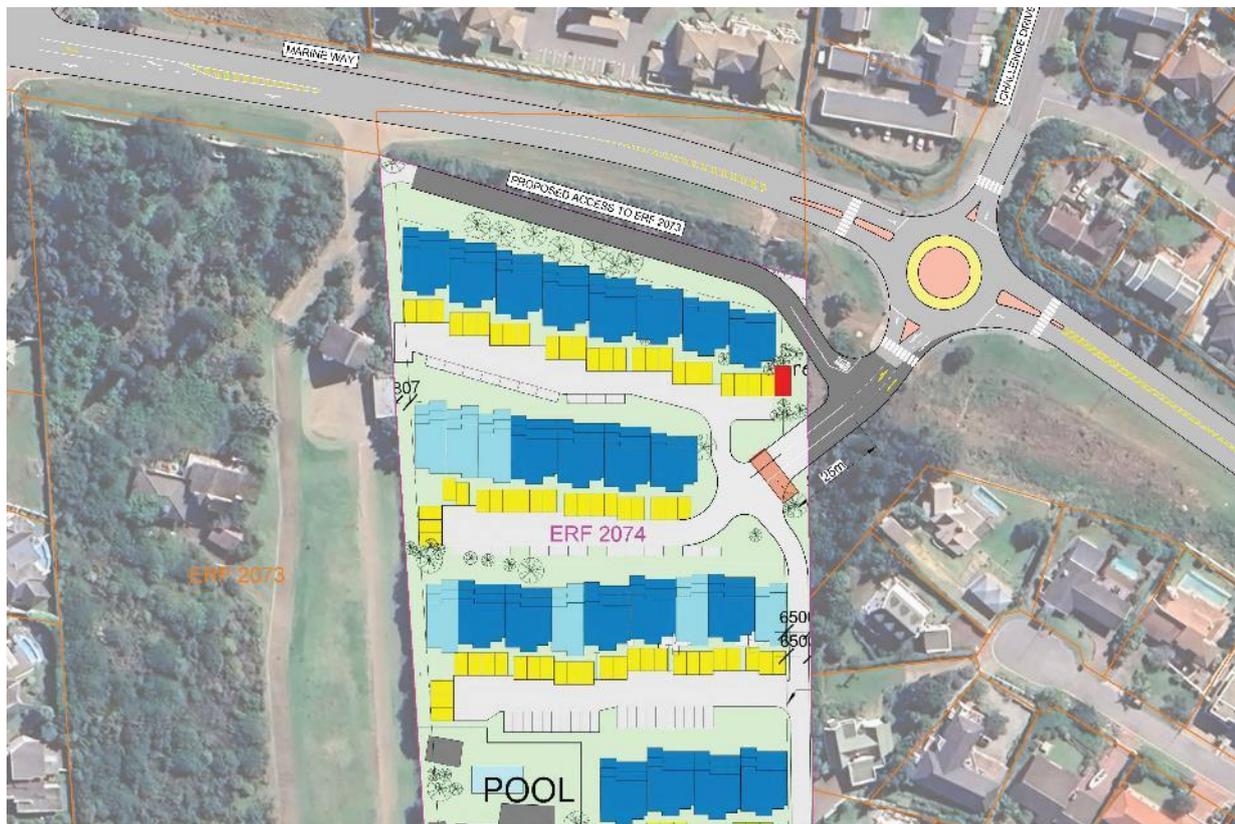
Road and access layout (adapted from figure 15, TIA, EAS, 2024)
